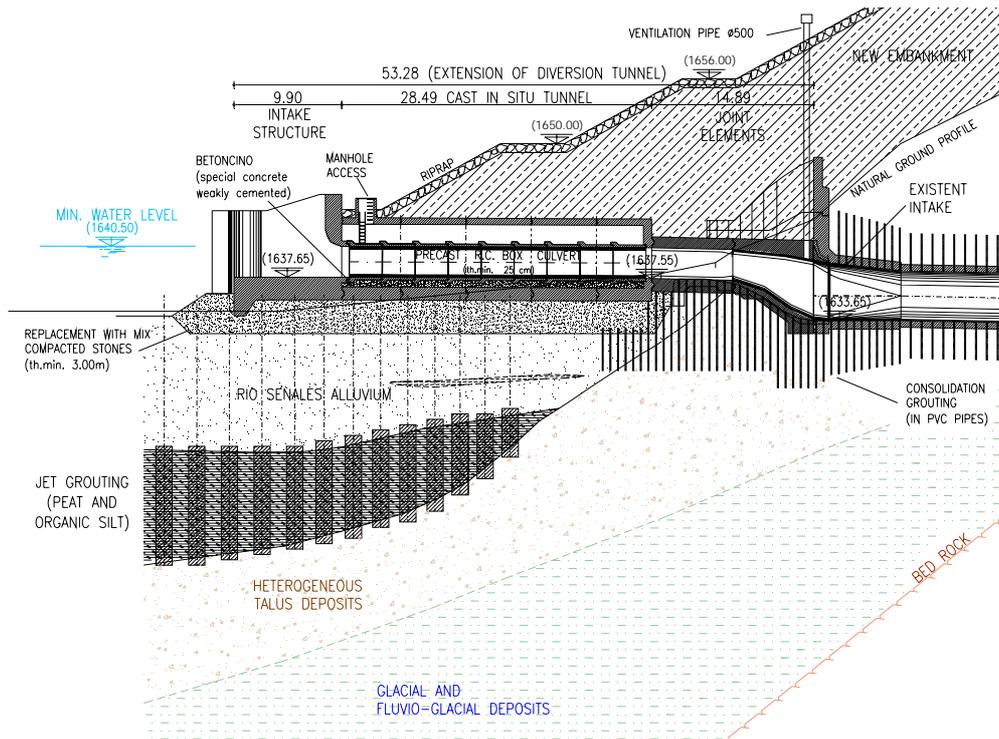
Half bottom outlet-diversion tunnel – Longitudinal profile
